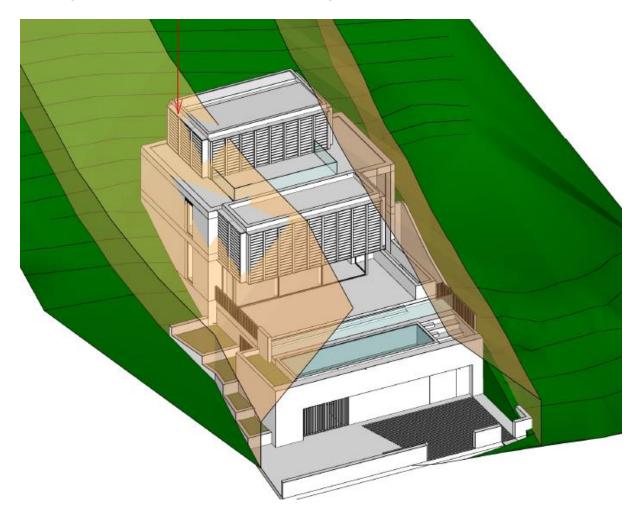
Plan extract DA12(E) demonstrating the extent of building envelope breaching elements
